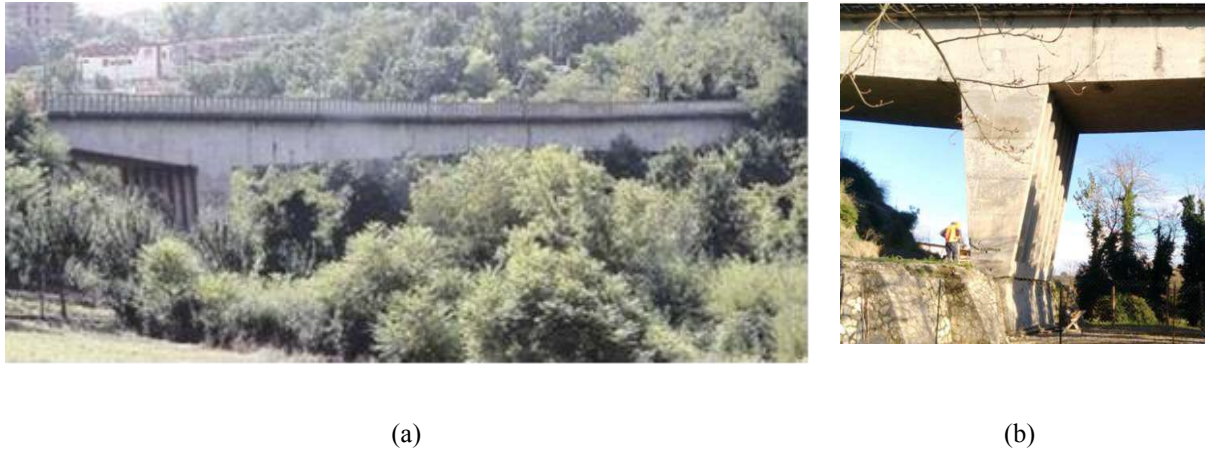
Side view (a) and detail of the abutment (b) of the San Nicola Bridge
